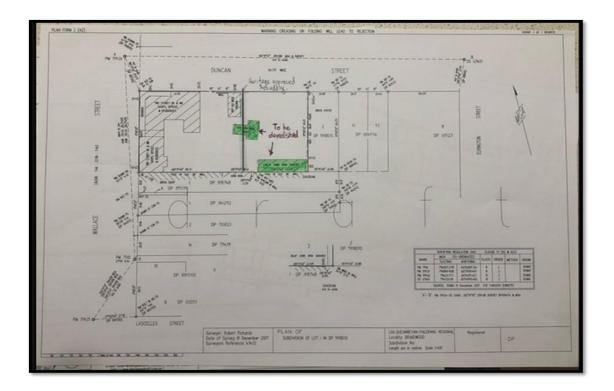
Demolition Plan – T shaped Shed and garages shown green
